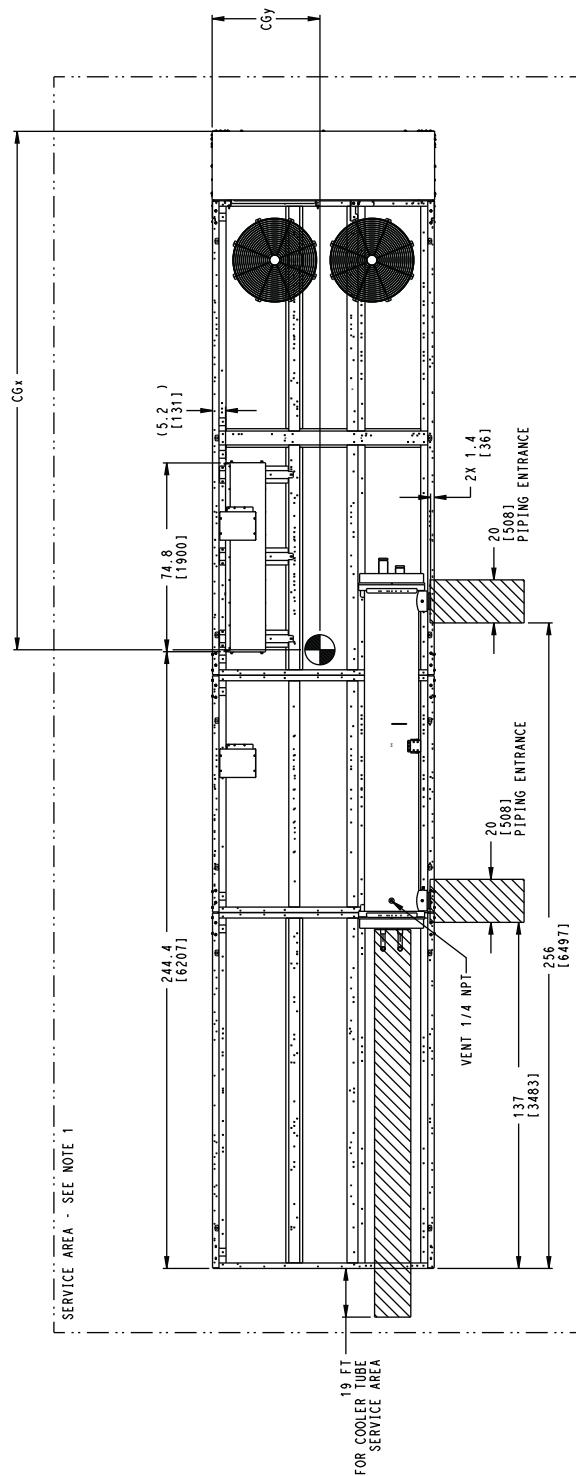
30XA302 Air-Cooled Liquid Chiller Dimensions (DX Cooler) (cont)
